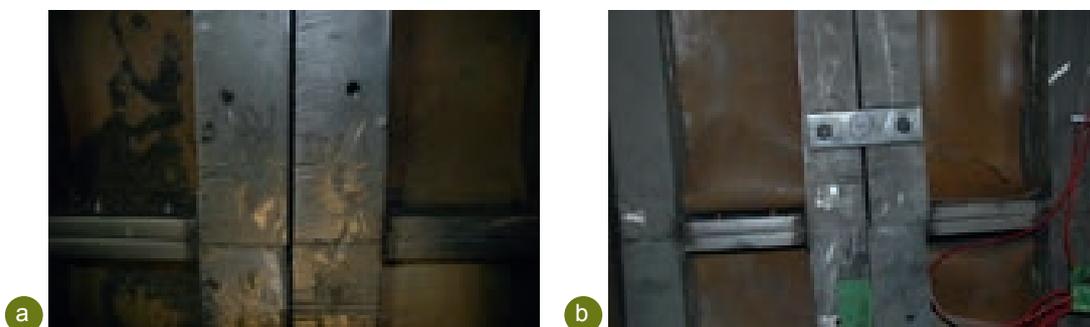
(a) Opening between rings 2 and 3 after removal of the wood around these rings; (b) Plates bolted over the rings to prevent them moving further apart.
